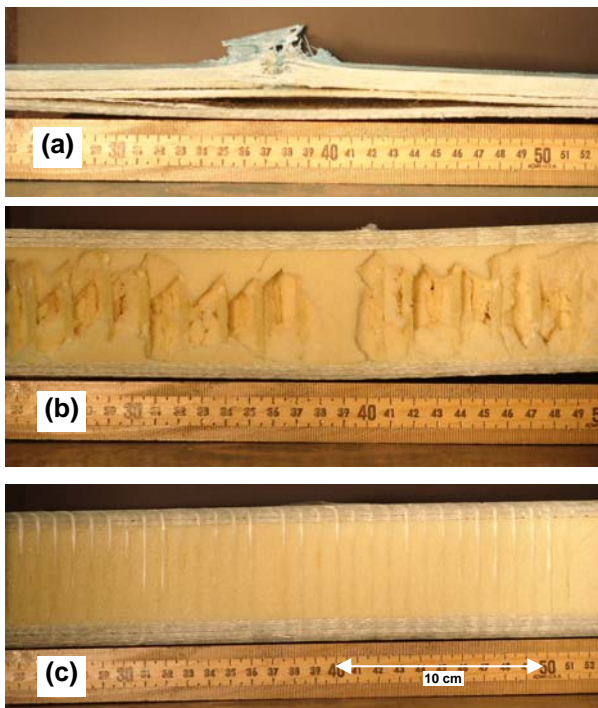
Side views of Sandwich 1 (a), Sandwich 2 (b) and Sandwich 3 (c) panels after blast testing
